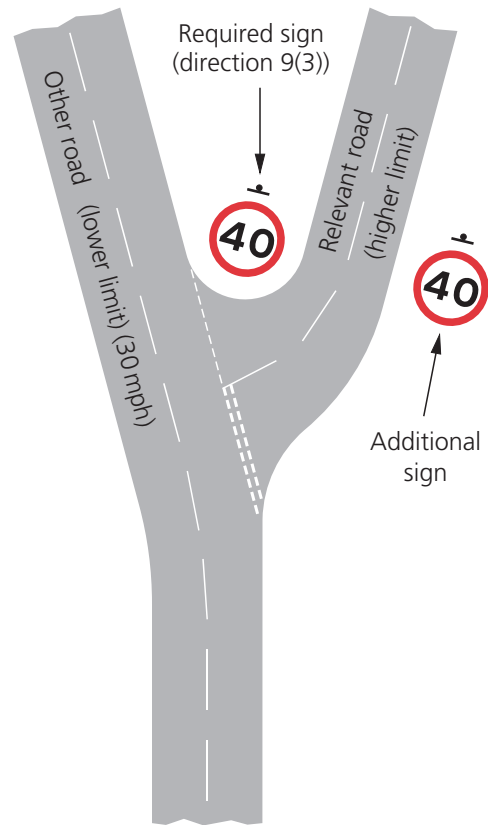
Road junction where the side road makes an acute angle with the major road (Signs for drivers entering the side road)
